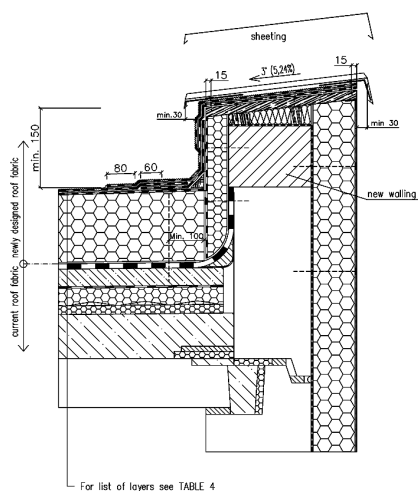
Detail of insulated attic gable – alternative with asphalt sealing sheet waterproofing
